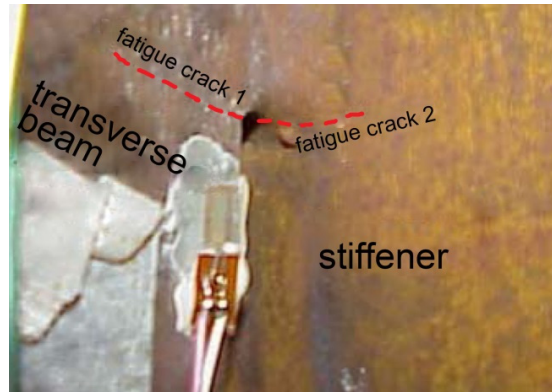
(b) Fatigue cracks - Specimen B
